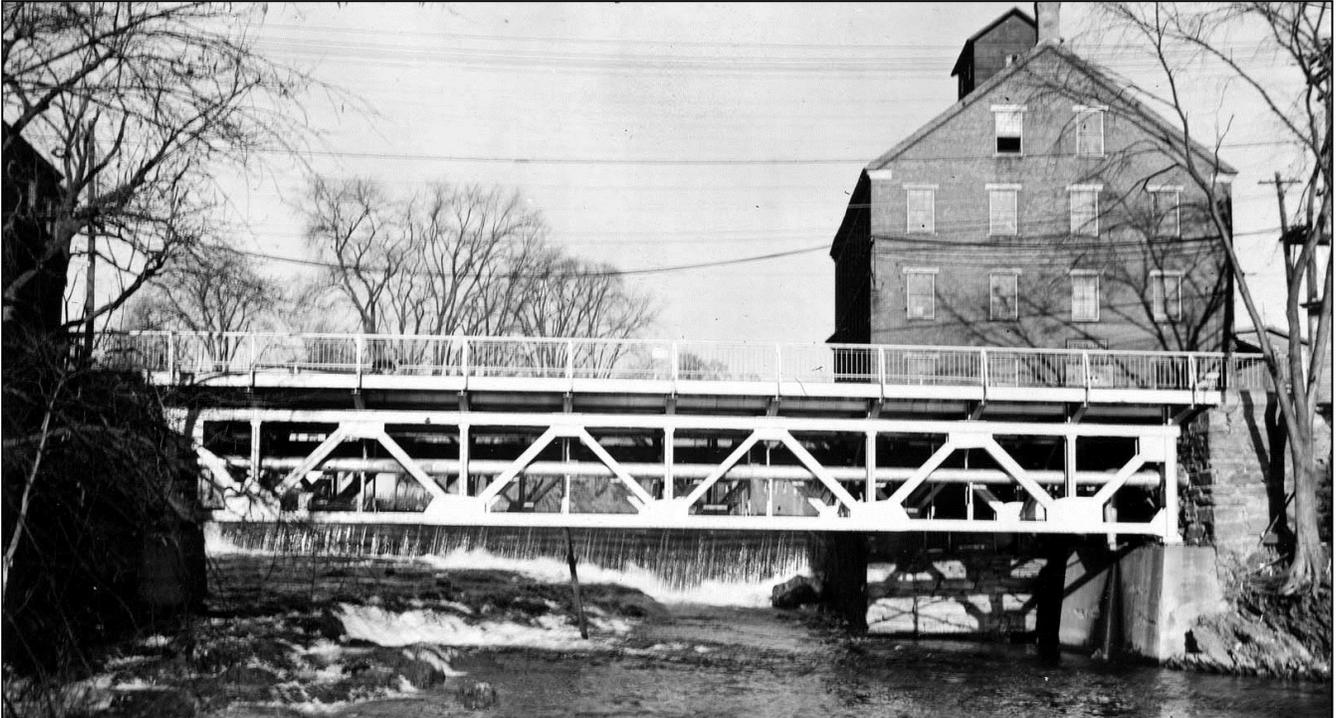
Claremont 122/098, "Lower Village Bridge" carrying Main Street over Sugar River. Storrs designed this 100' Warren deck truss for the City in 1915, as well as the Broad Street Bridge (Figures 51-52). Built by Boston Bridge Works at a cost of \$7,990. Storrs was paid \$399.50 for engineering services. The bridge was documented to HAER standards in 1995 prior to its replacement the next year (see HAER NH-23). Photo November 19, 1940 (NHHD Bridge Inventory Card).
